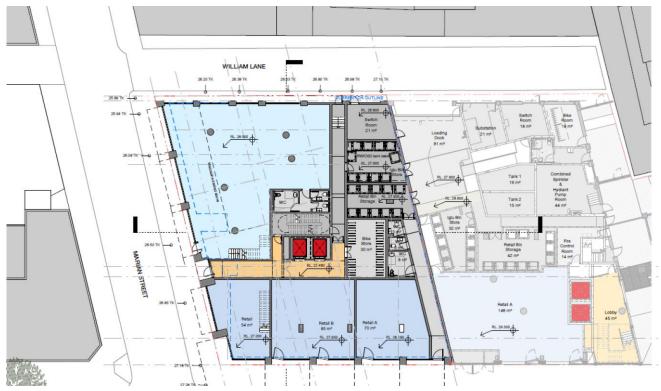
Proposed Ground Floor amalgamated with the existing adjacent Iglu
